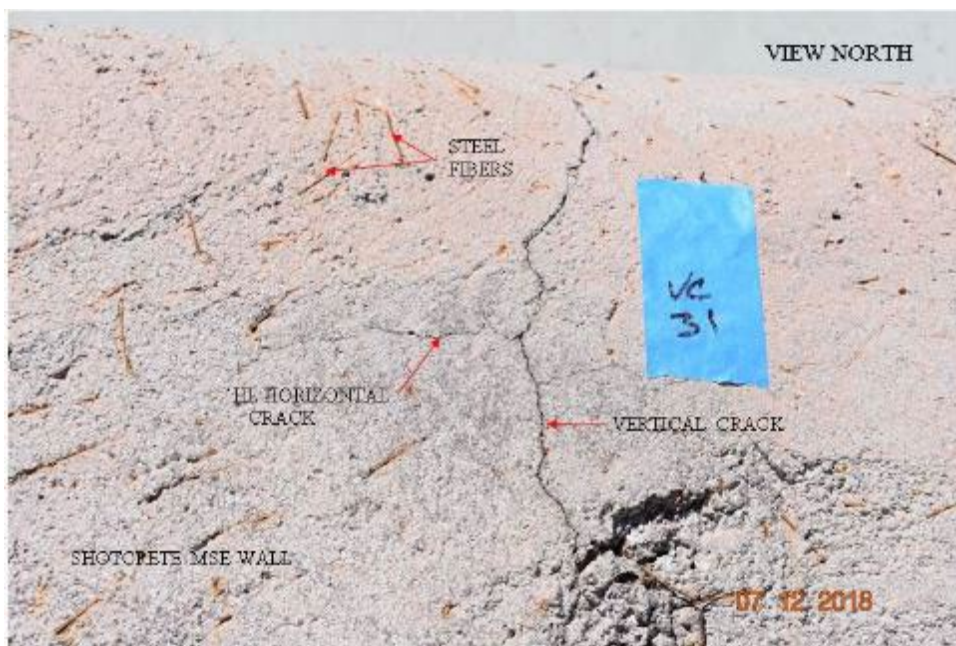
Vert. and Horiz. Cracks in MSE Wall Shotcrete, STA 2 + 37.1, Topaz Bridge
